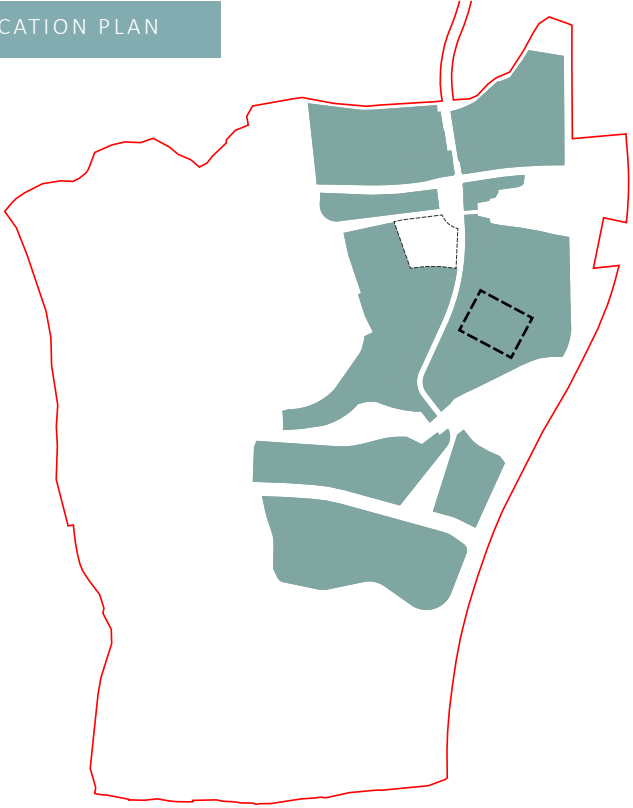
ILLUSTRATIVE PLAN VIGNETTE
